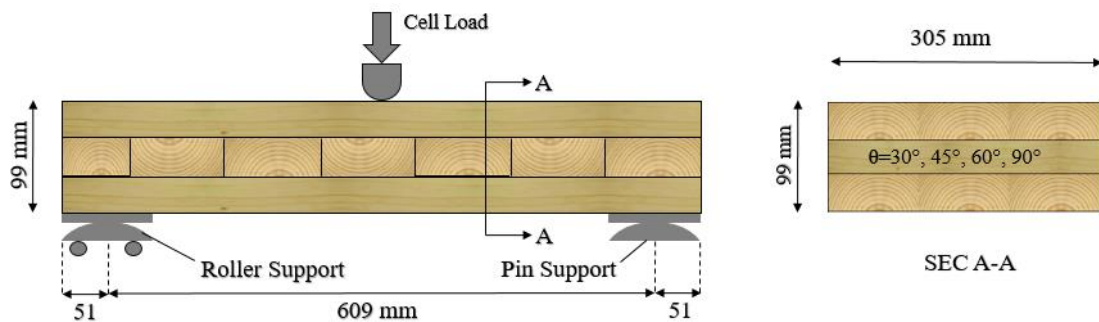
Longitudinal and cross-section of CLT floor panel
